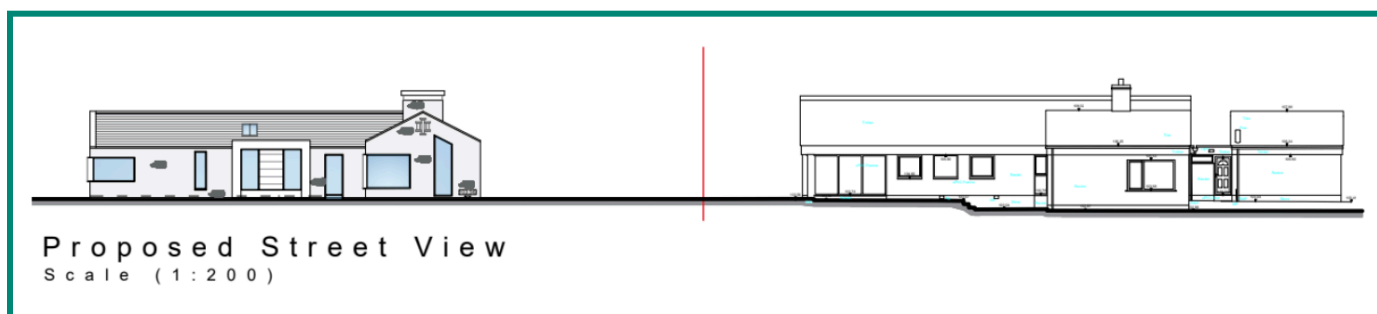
Proposed street view of dwelling and neighbouring host dwelling
